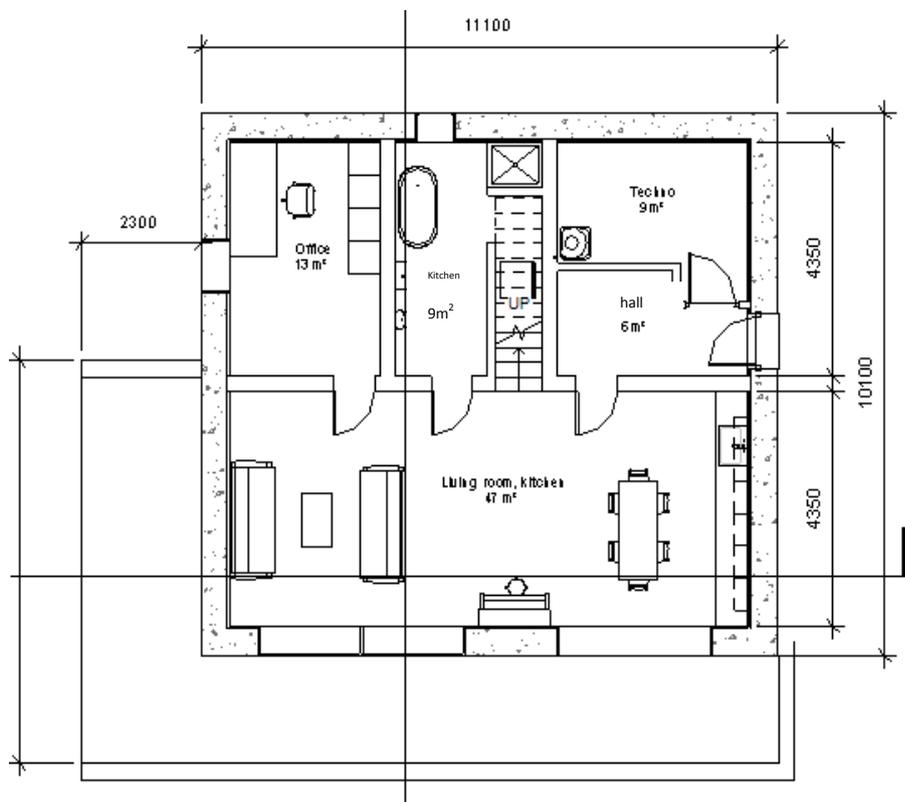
Specific dimensions of the floor plan drawn between the walls specify room sizes
